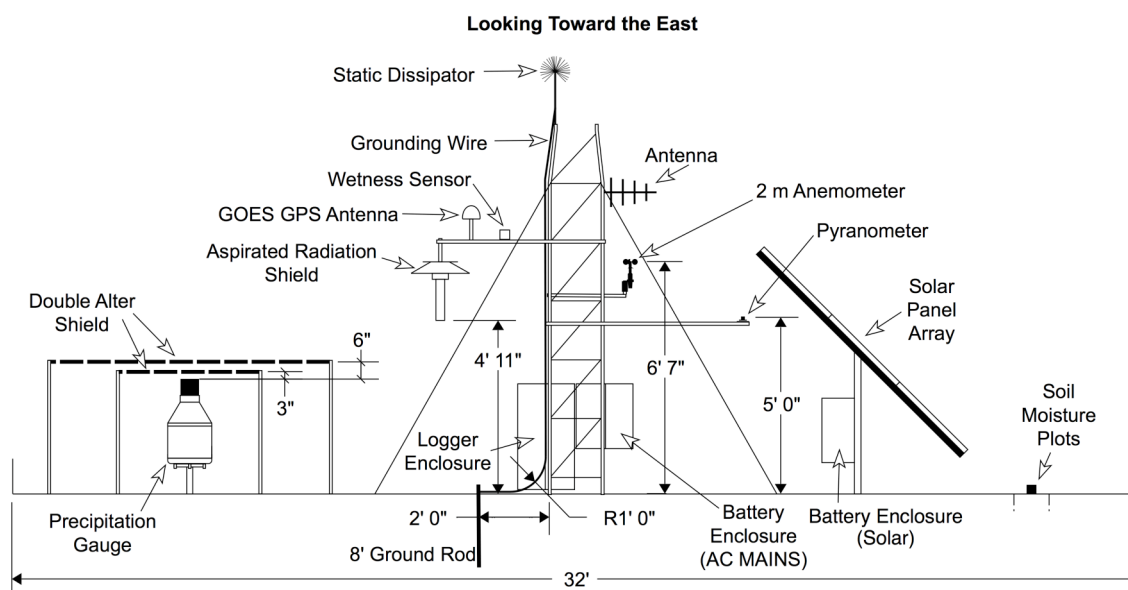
Profile view of a station plot that measures 32-by-32 feet and has a 3-meter tower.
